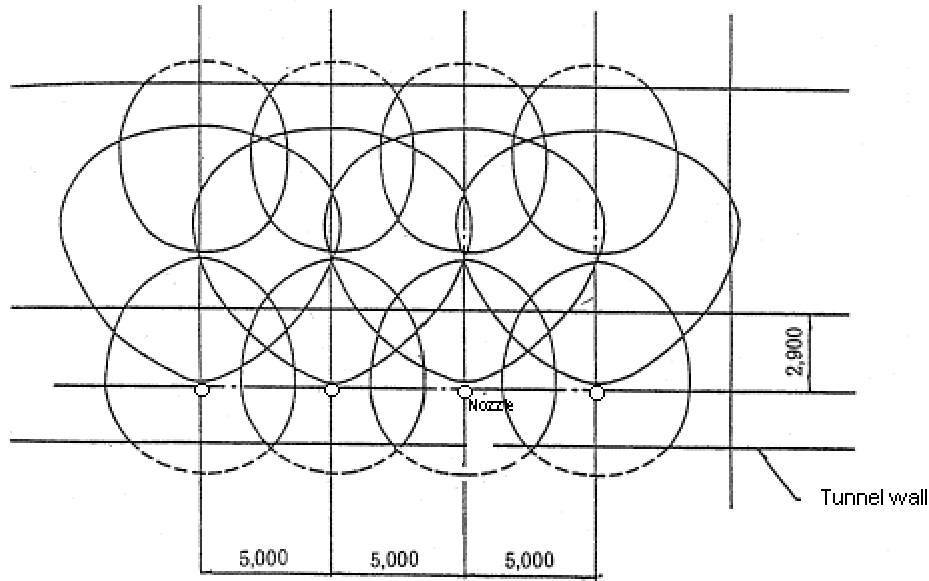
Examples of how sprinkler sections are selected (uni-directional tunnel)
